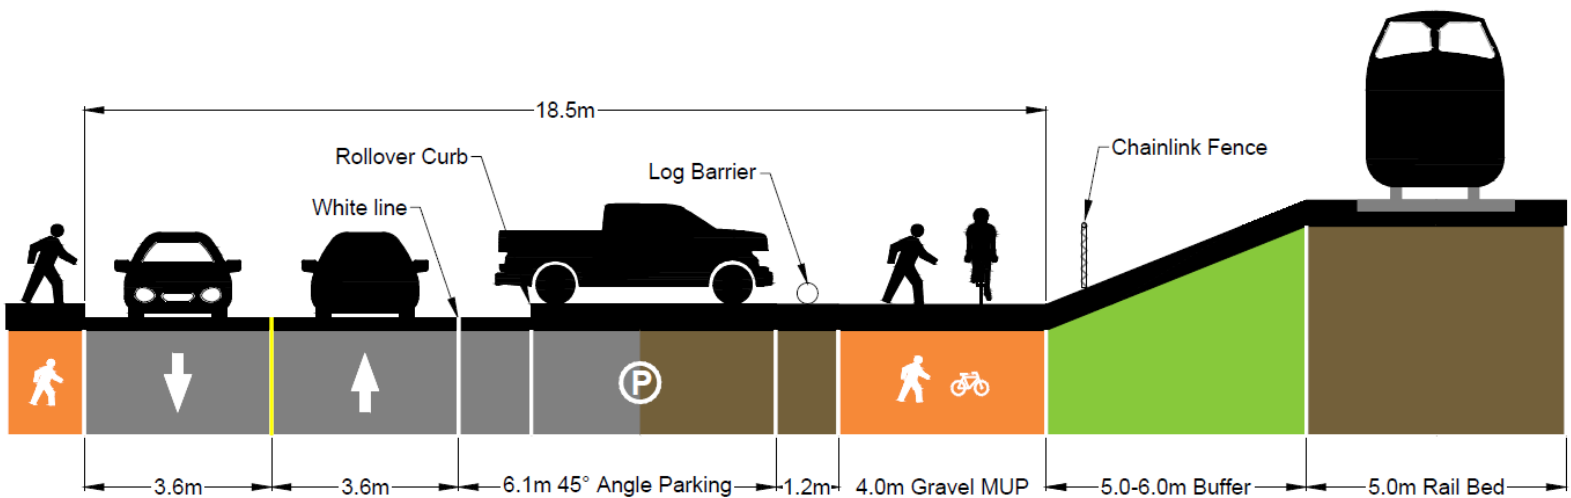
MUP Retrofit on Pleasant Valley Road from Bridge Street to Armstrong Elementary (Looking North)
